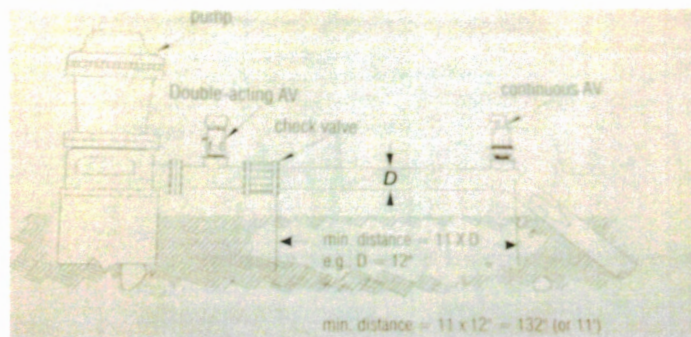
Air vent placement at pump location (Burt and Styles 2011).
